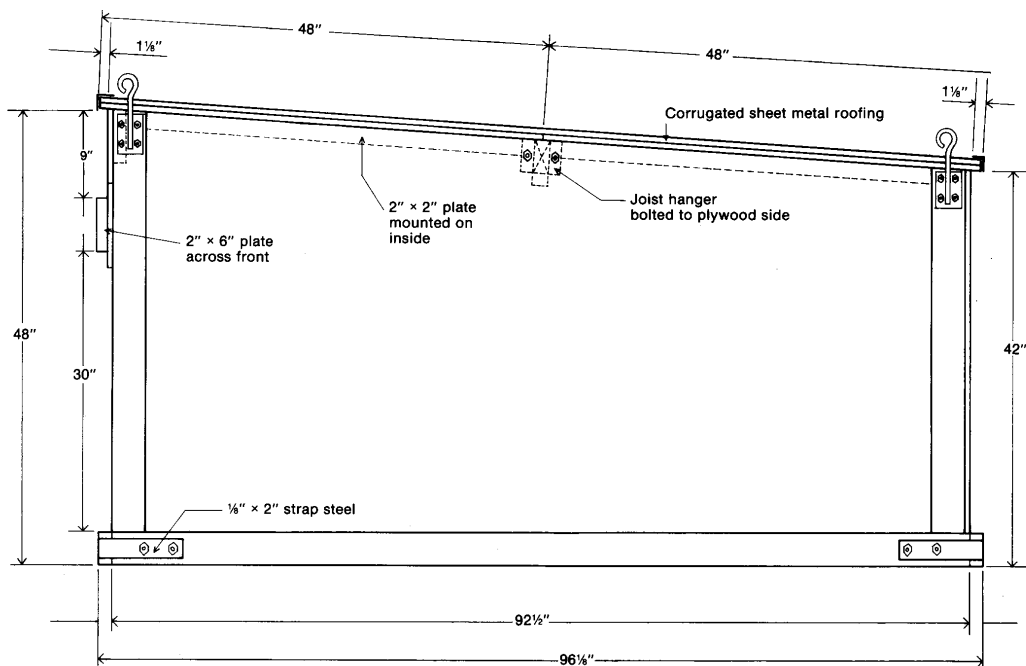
Side view construction plans for the University of Idaho calf shelter.
